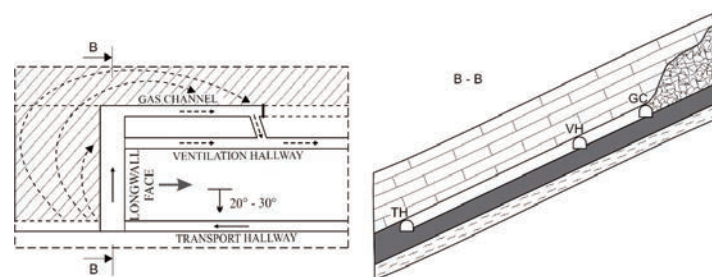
Longwall roof plate mining introducing gas channel and the middle hallway
